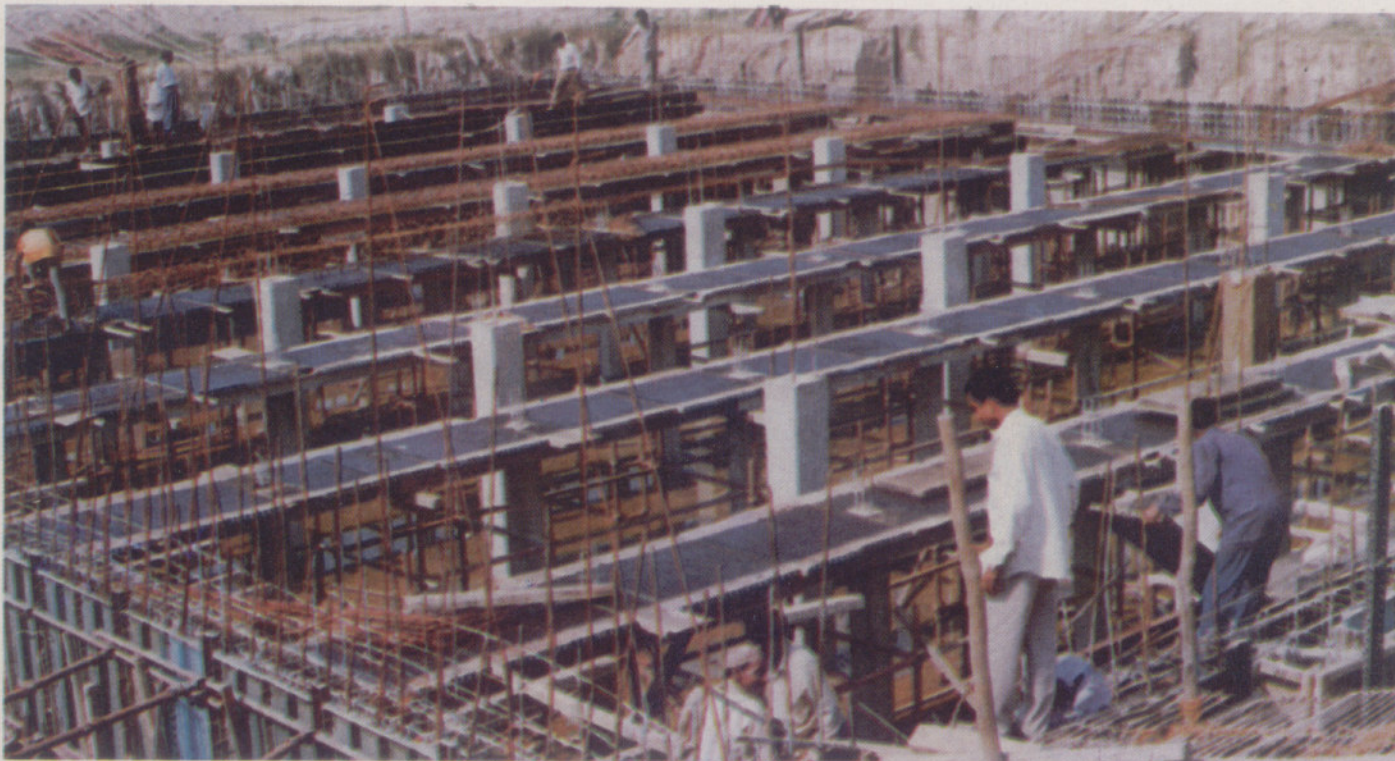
Construction of Sewage Treatment Plant, Zone-I at Faridabad, Haryana
